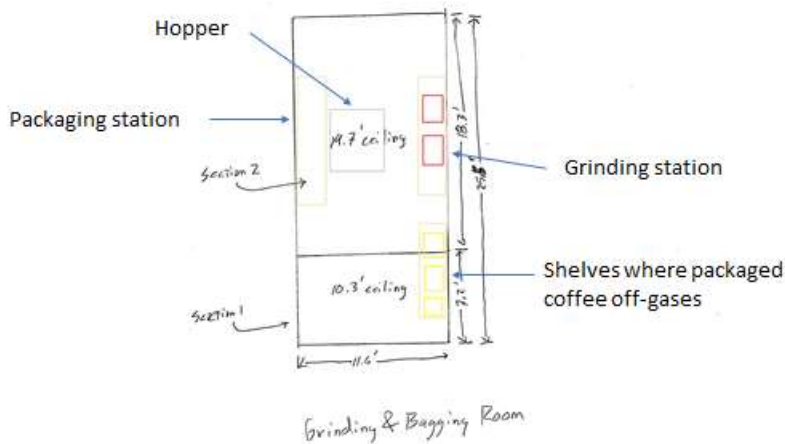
Approximate layout and room dimensions of the facility's grinding and packaging room.
